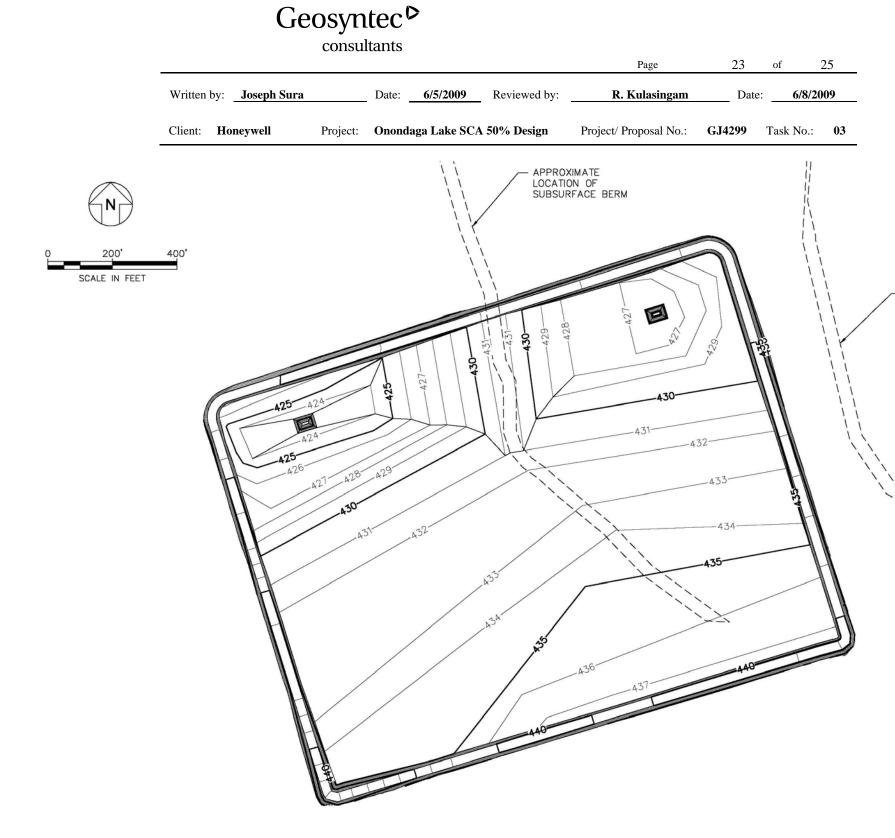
Proposed Low Permeability Soil Liner Grading Plan for Option 2 (1.9 million cy)
